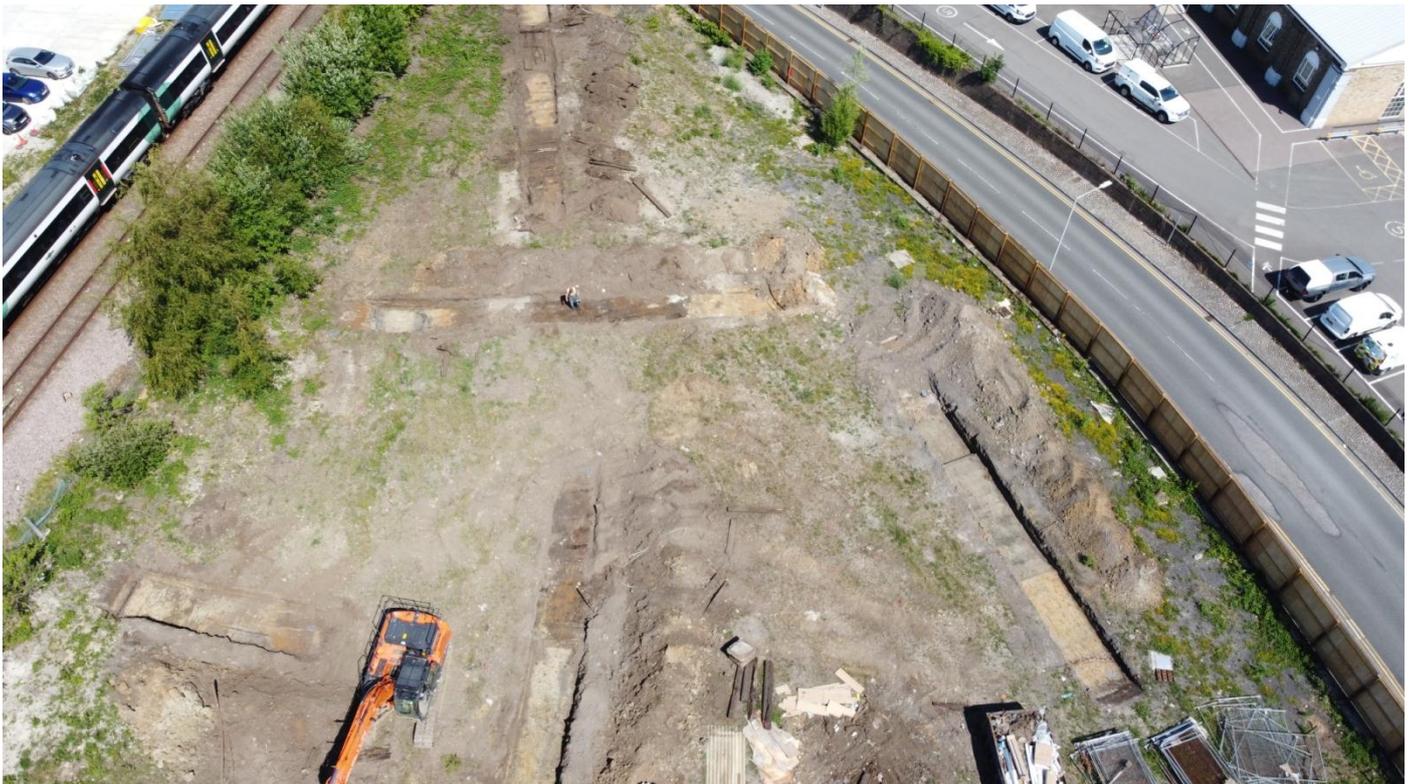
Looking north at south area of the site with some railway sleepers still in situ; showing trenches 2-6
